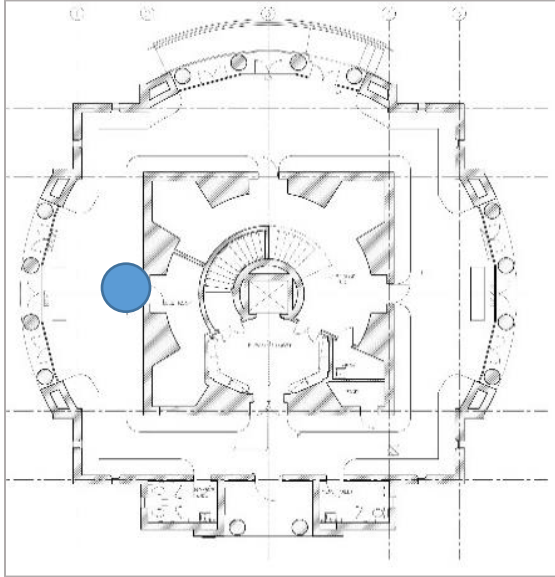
Location of the water damage on the *California* Mural at the first floor.
